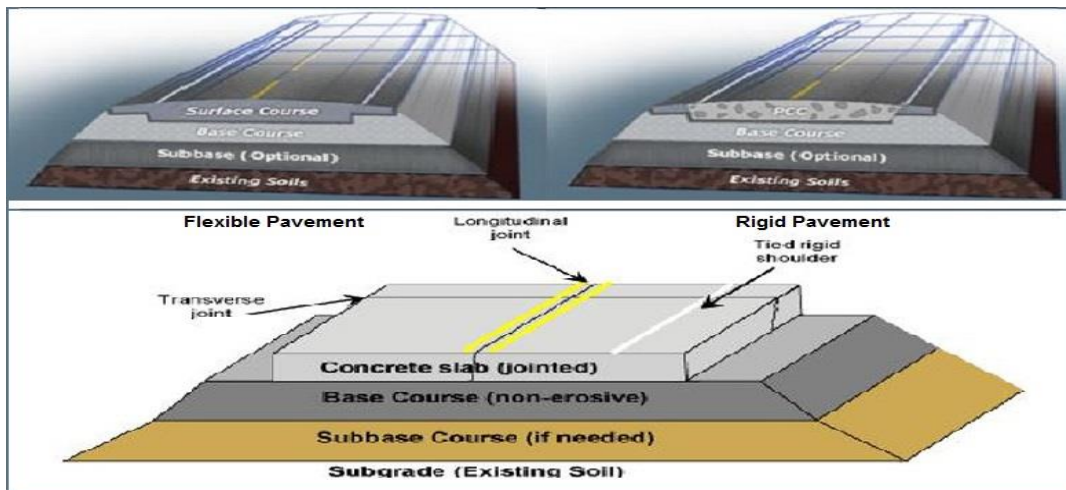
Types of pavements: flexible pavement and rigid pavement
